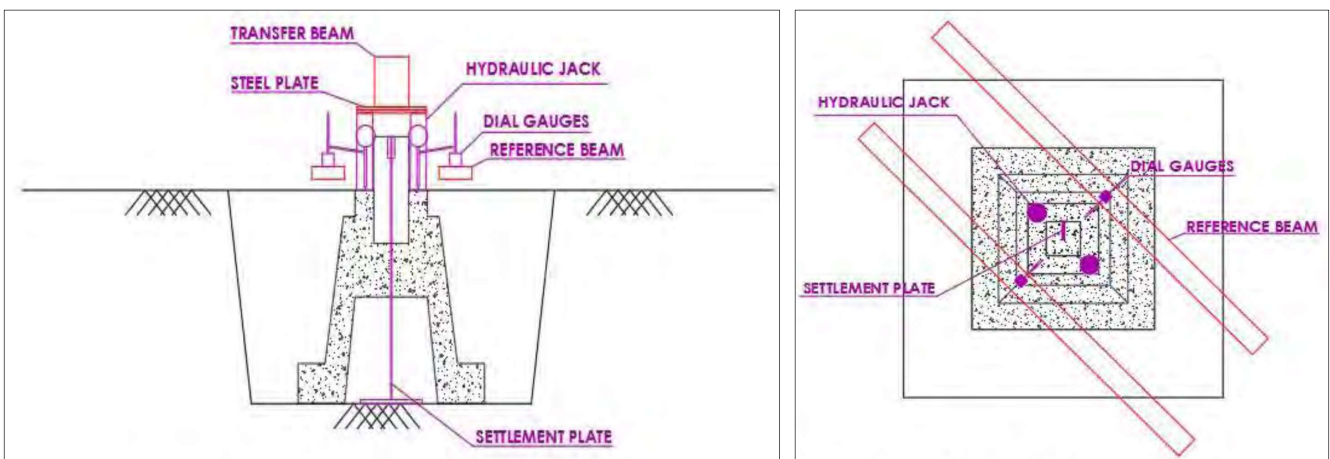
Installment of instrumentation in cross-sectional view (left) and plane view (right)
